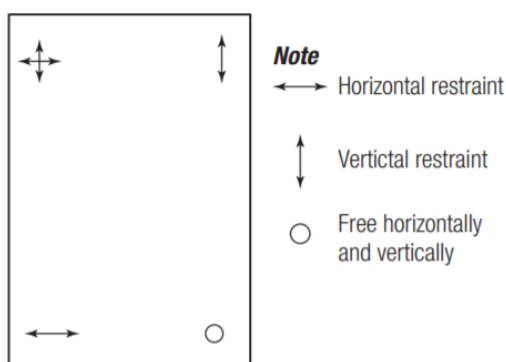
Typical arrangement of bolted connections (O'Regan, 2014)
